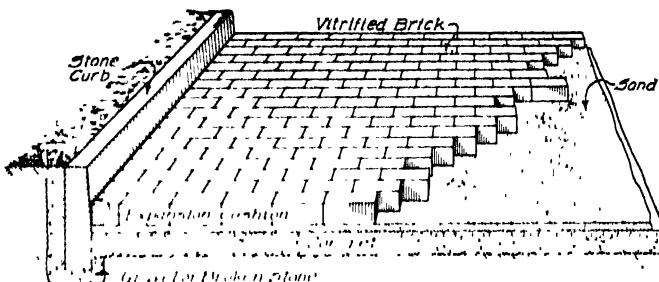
Section Showing Method of Laying Vitrified Brick Pavement.
